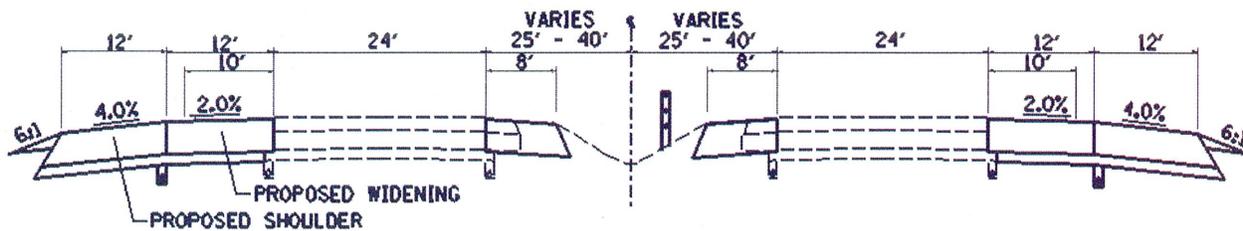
PROPOSED OUTSIDE WIDENING LAYOUT
